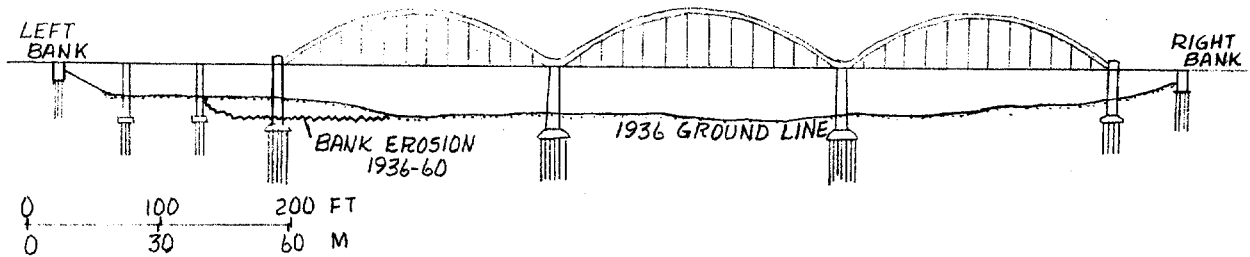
Elevation sketch of PH-5 bridge, North Saskatchewan River, showing bank erosion.
